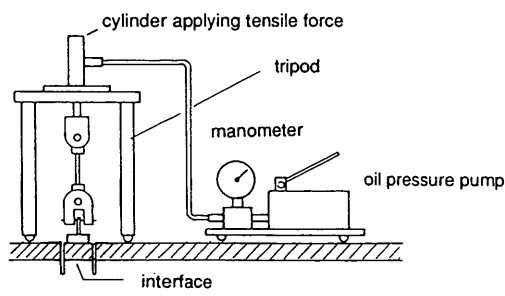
Special pull-off device used to test the bonding of layers (field test on ring-groove drilling holes).
